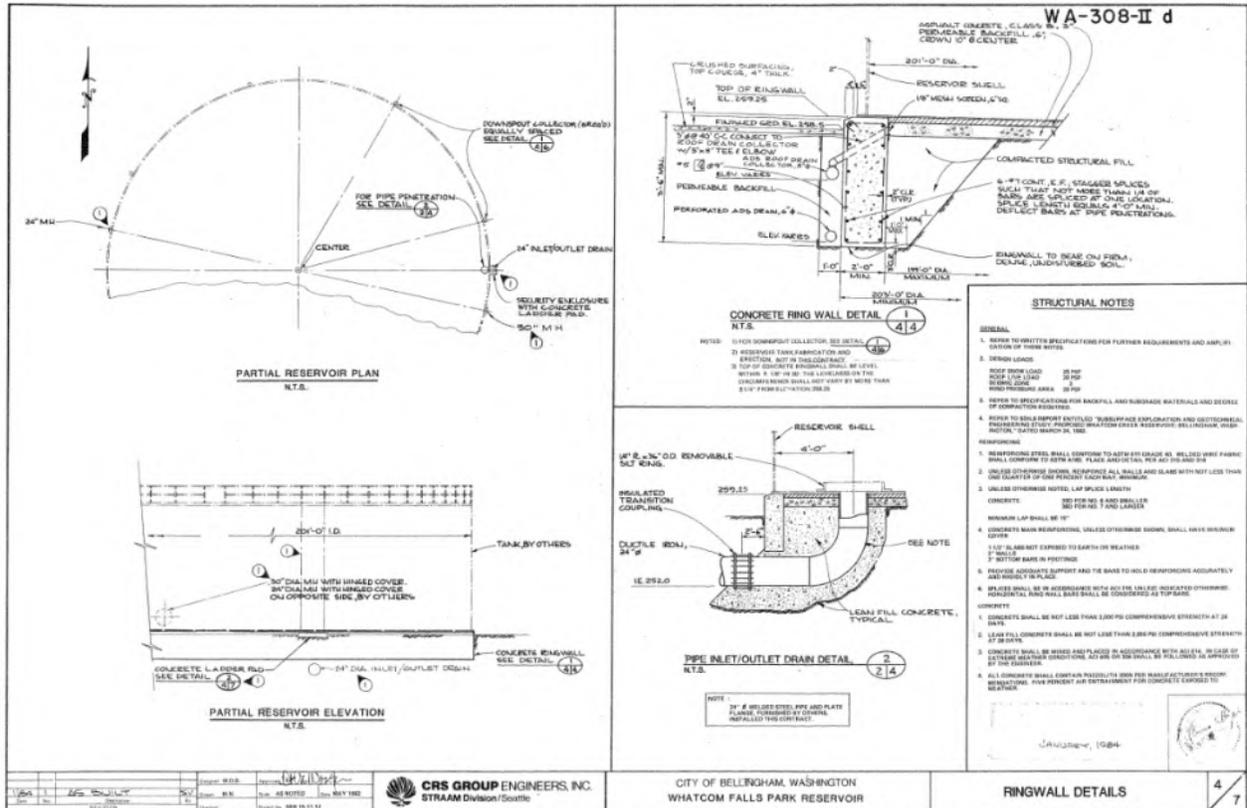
Whatcom Falls 1 – Ringwall Details
